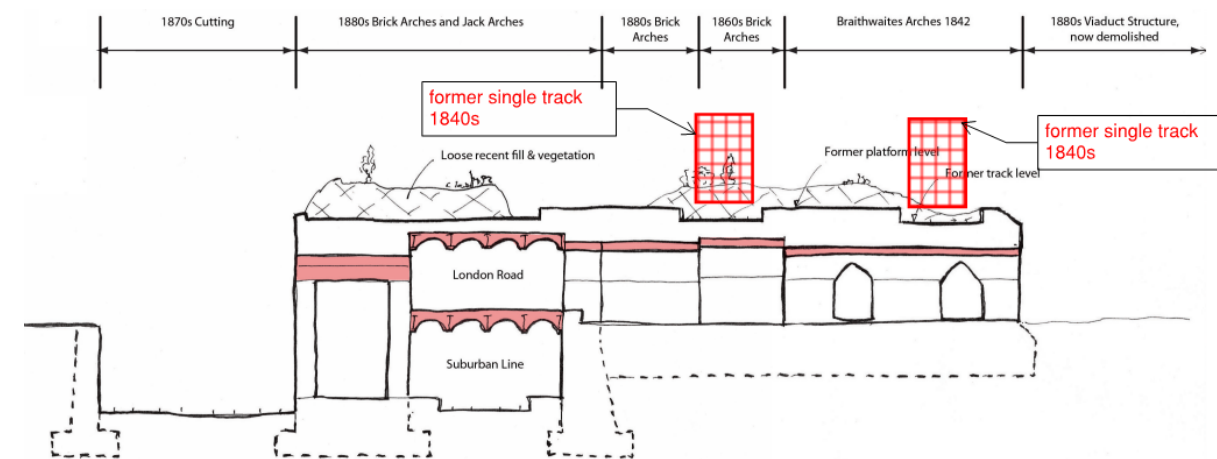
Typical section through viaduct showing former platforms and train track 1840's
